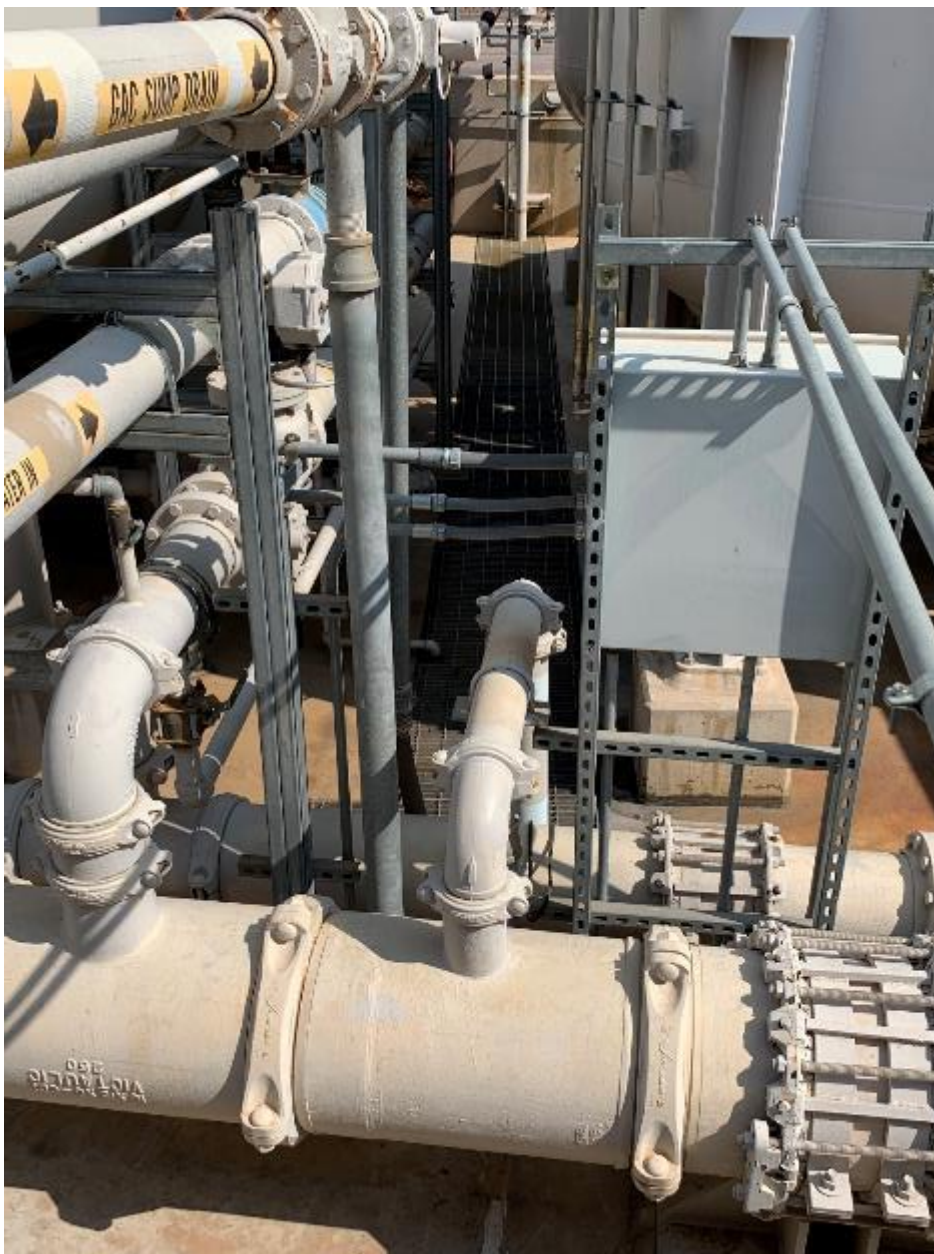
OU2 sump (in center) pumped to backwash wastewater tank then sent to City sewer
